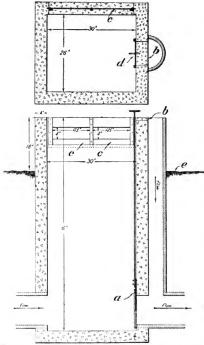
Device used by Covina Irrigating Company for measuring miner's inches: a, main waste way; b, overflow waste way; c, miner's inch openings; d, galvanizediron crest of overflow waste way; c, level of the ground.
